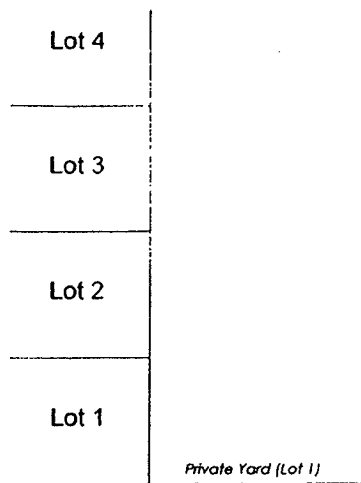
Private Yard unacceptable, as lots 2 to 4 are above Lot 1.
